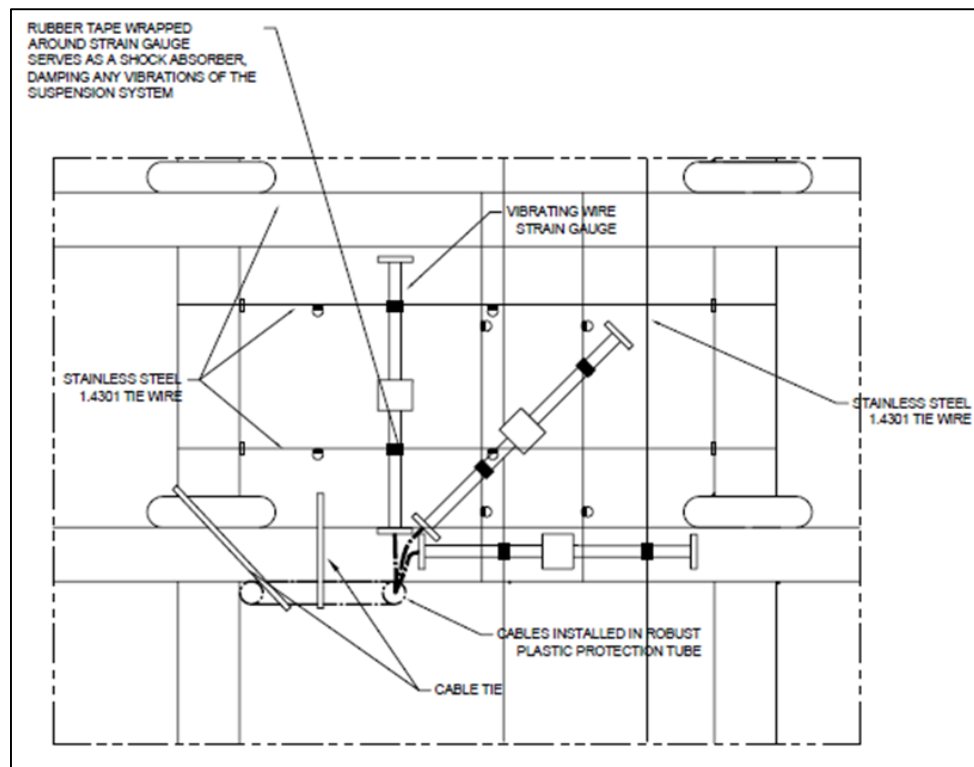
Principle arrangement of the rosette static strain used in the road deck slab
